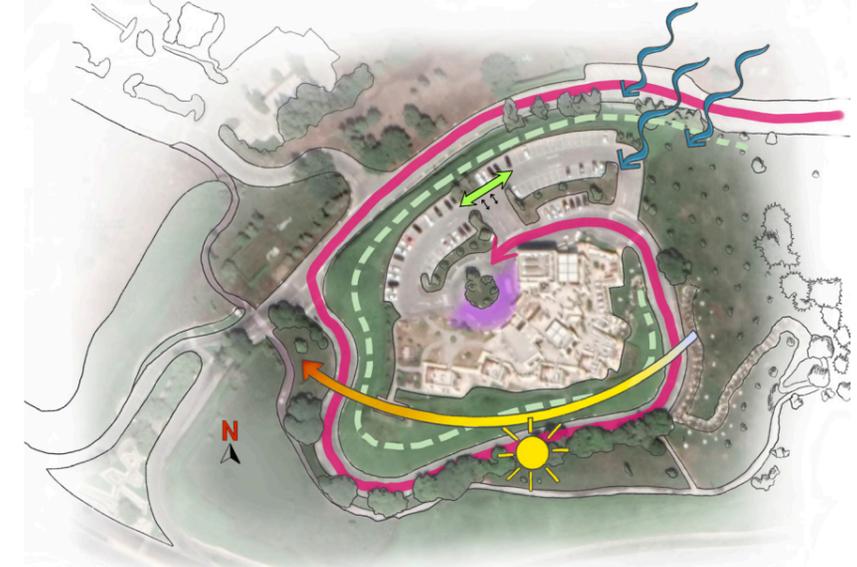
Site study illustrating the sun's direction and the glass façade that wraps around the south side of the building.
